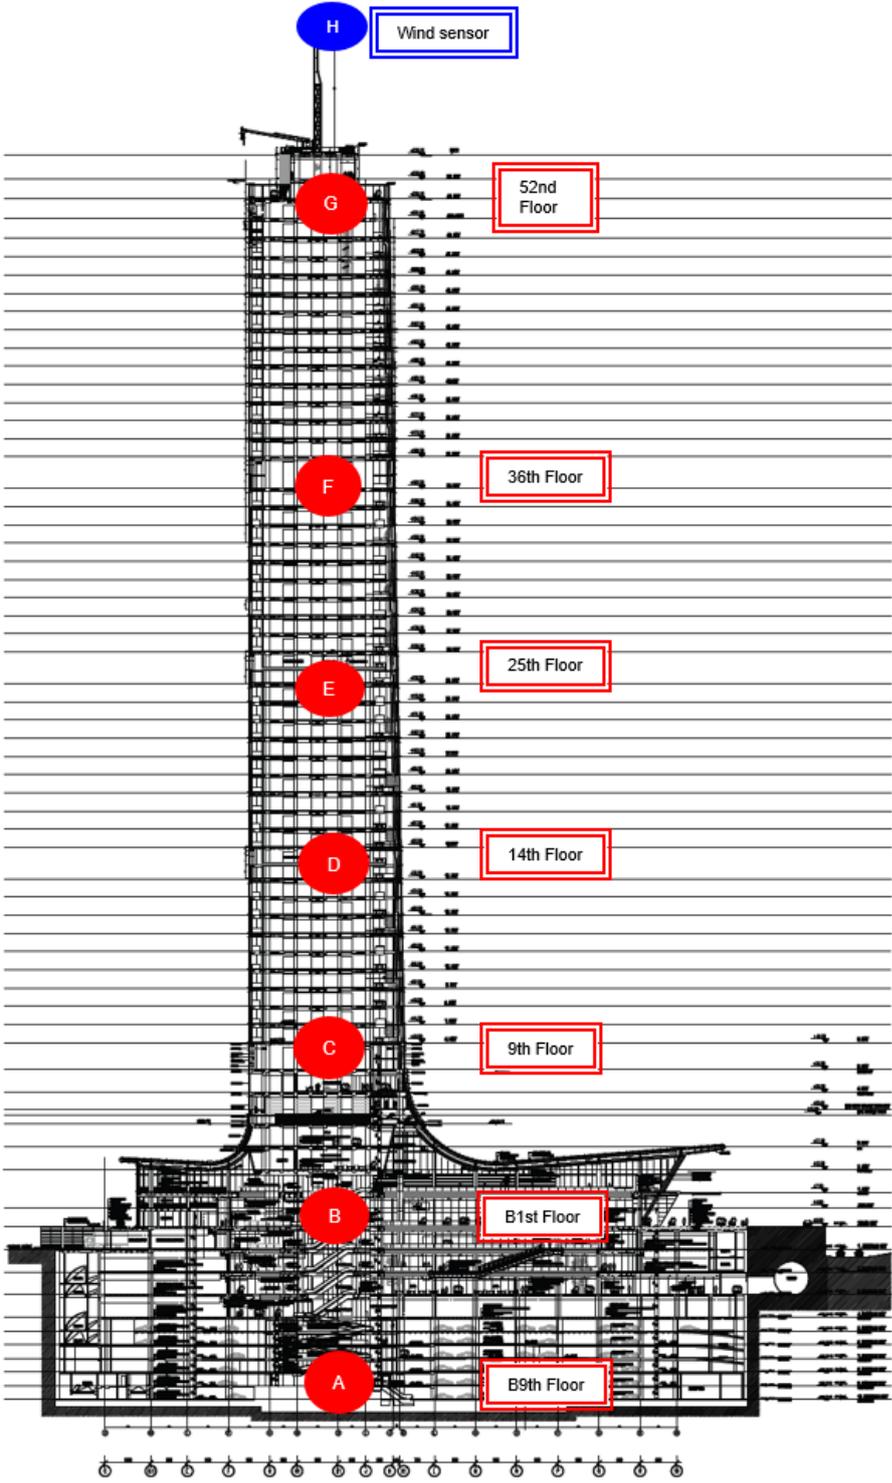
Locations of instrumented floors in the Sapphire building in Istanbul, Turkey.
